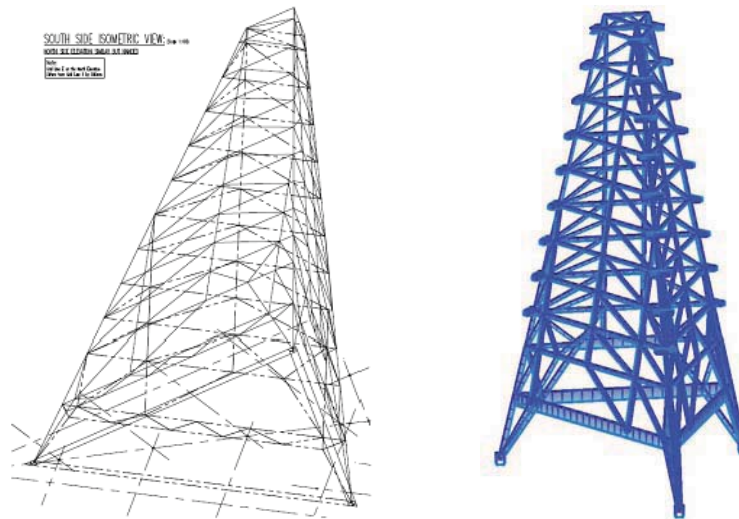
Structural Frame (a) Isometric view (b) Vulcan view
